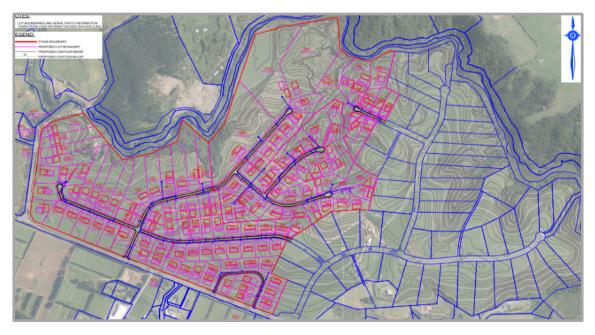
Current proposal and existing subdivision. Both differ substantially from the 2009 plan
